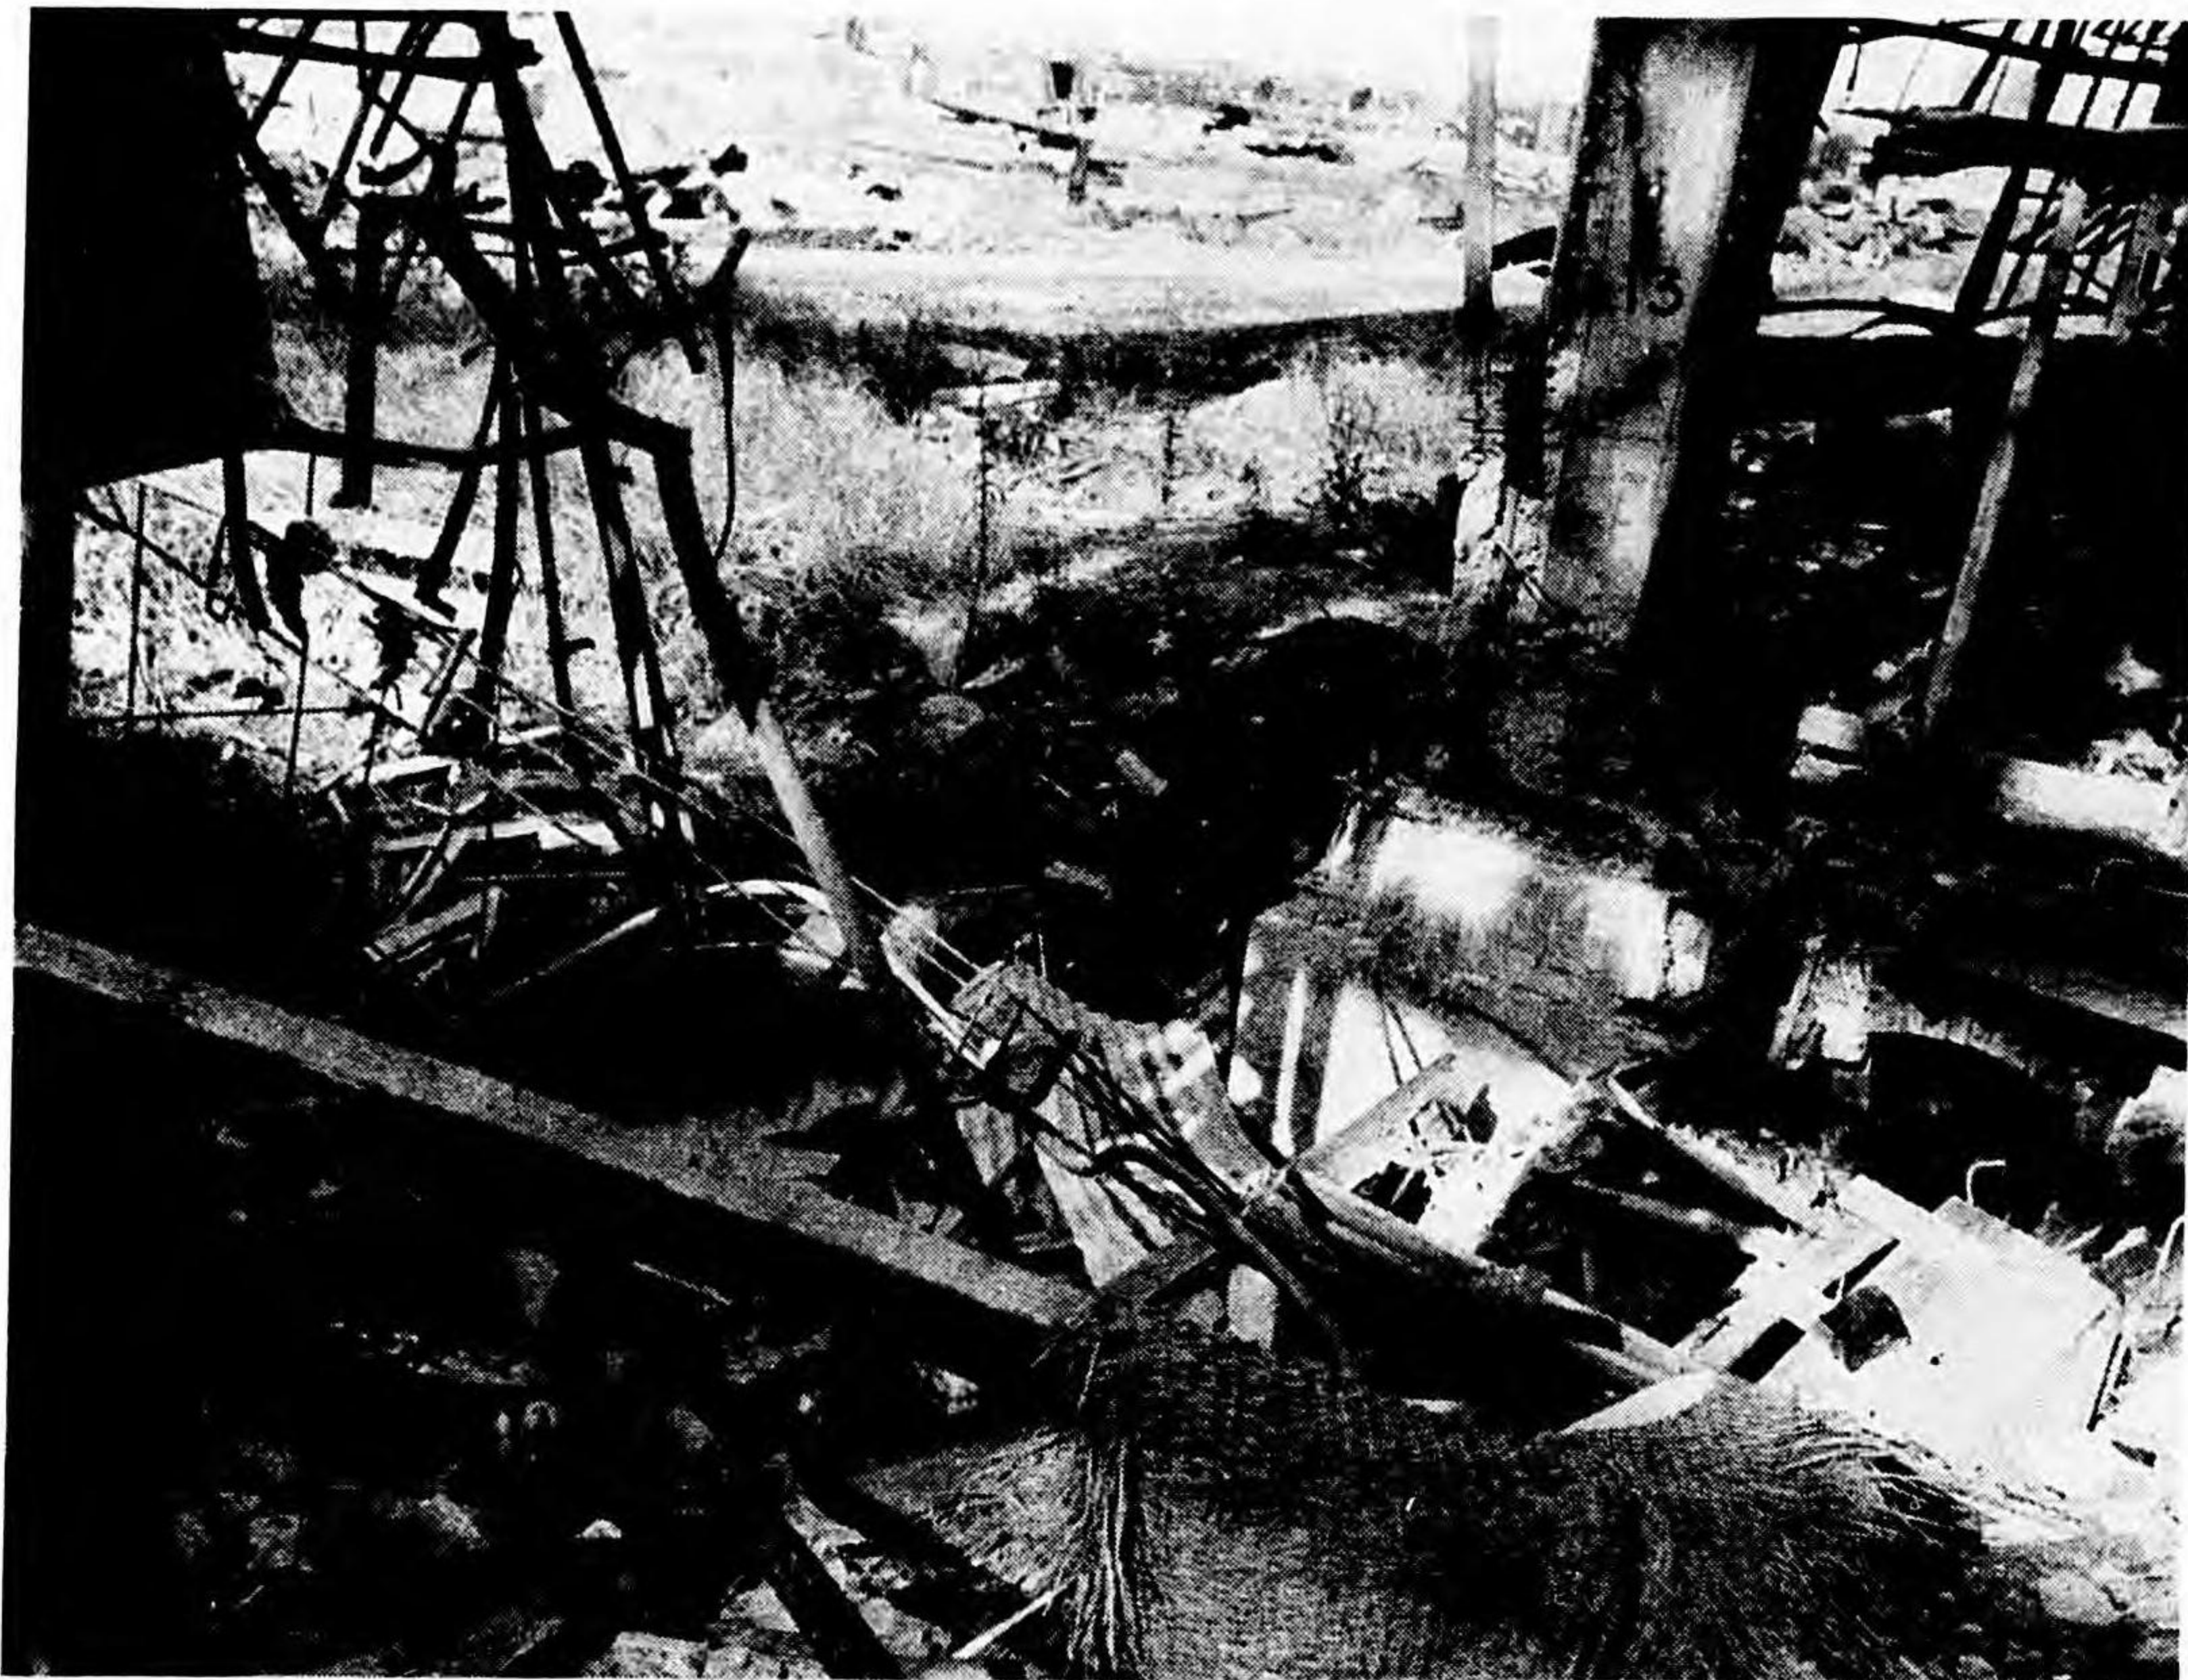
Building 302b; base of Column A13 undamaged by cratering bomb looking N.
